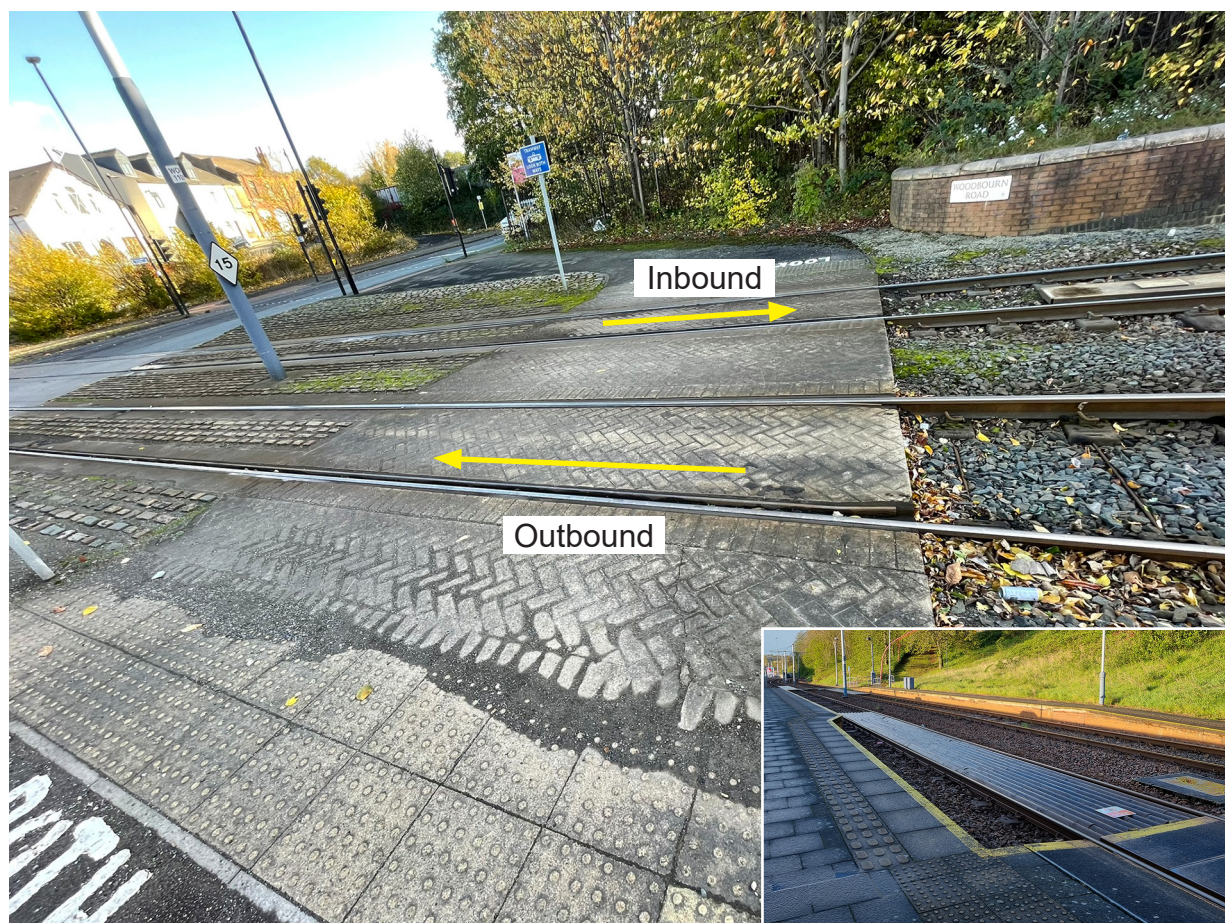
Absence of underrun protection infill on the inbound track and (inset) an example of underrun protection installed at a crossing elsewhere in Sheffield.
